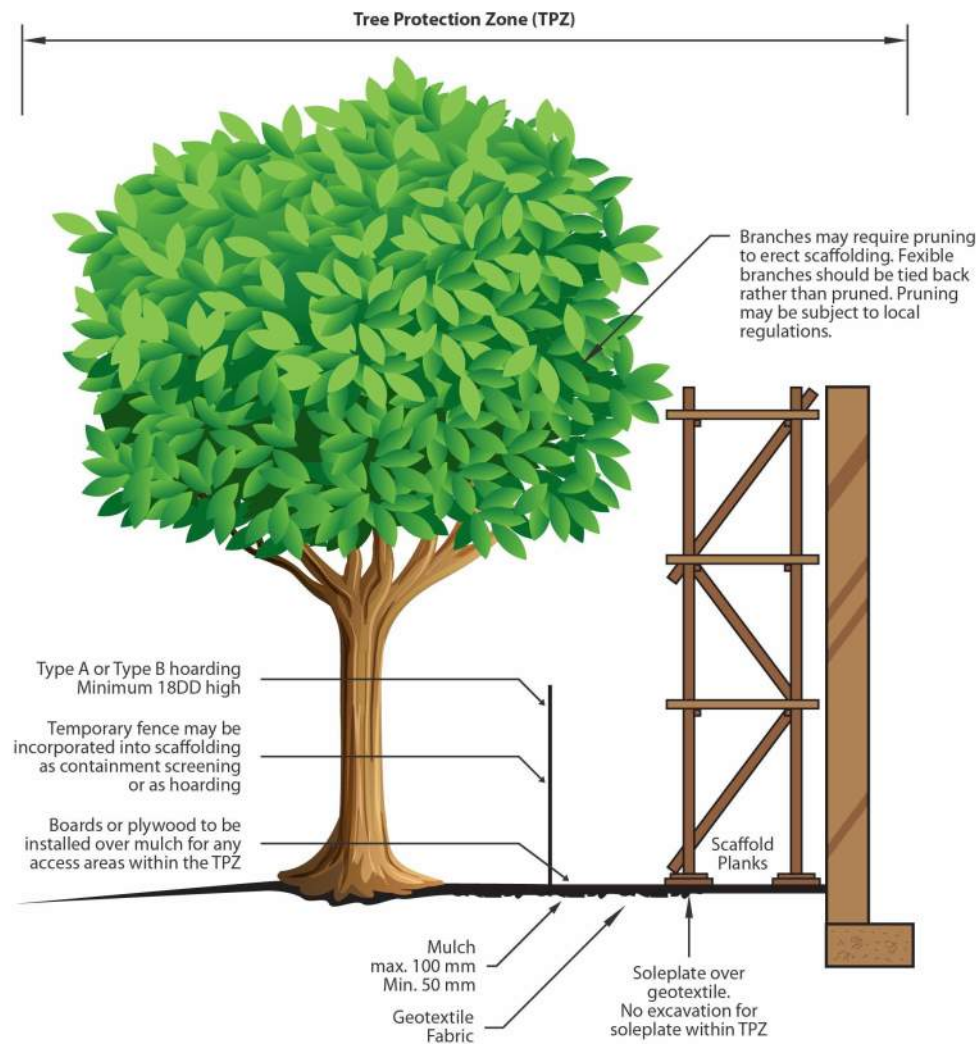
Details of trunk, branch and ground protection. (Standards Australia, 2009)
